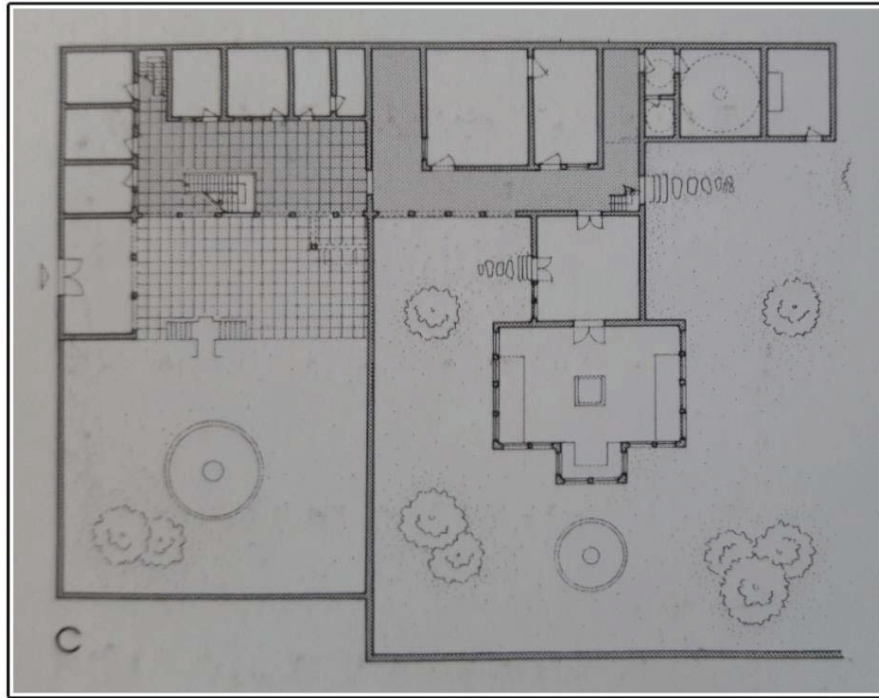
18<sup>th</sup> century house: Ground floor plan of the house in Vezir Köprü.
